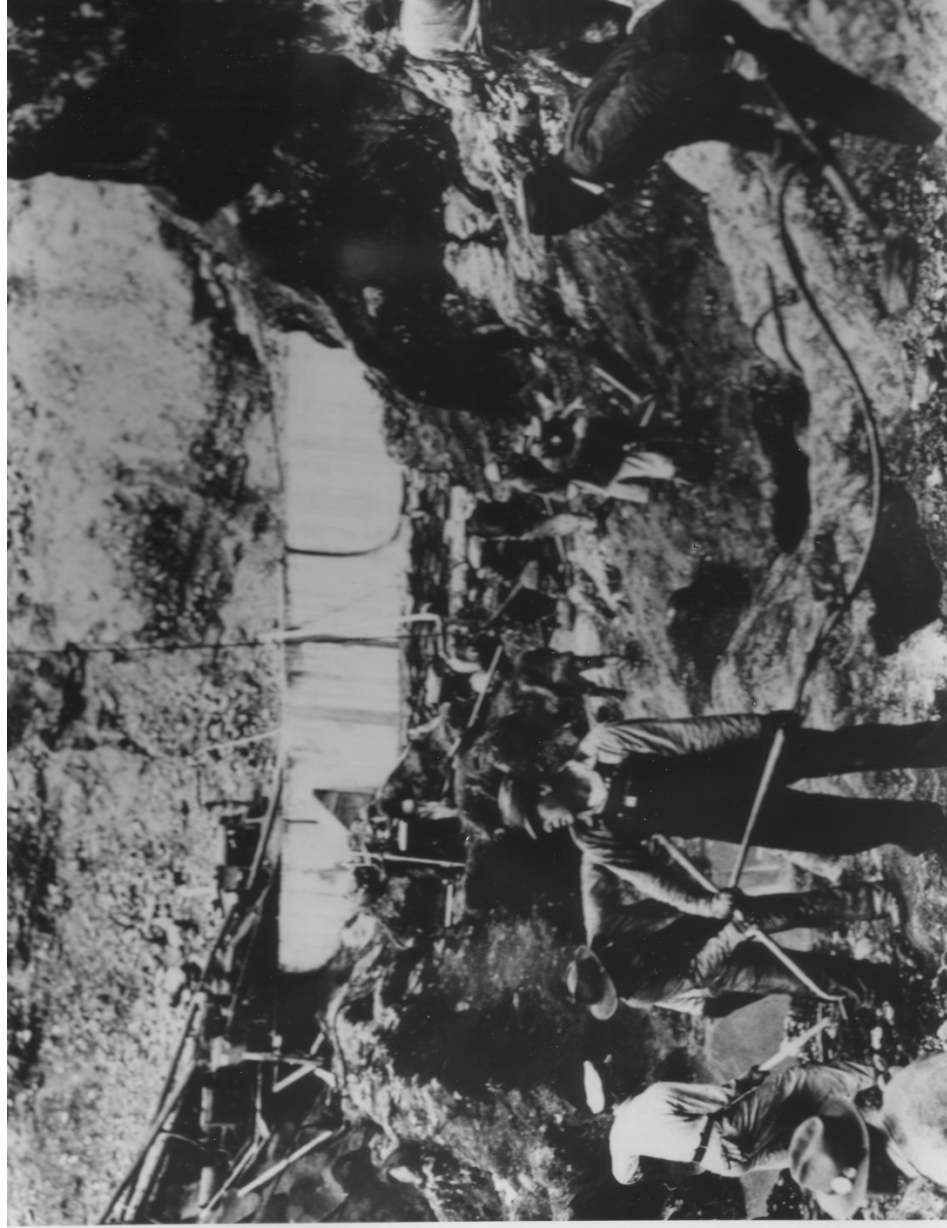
FOUNDATION EXCAVATION, SHOWING CONCRETE CORE WALL IN CENTER BACKGROUND. 25 November 1944.
